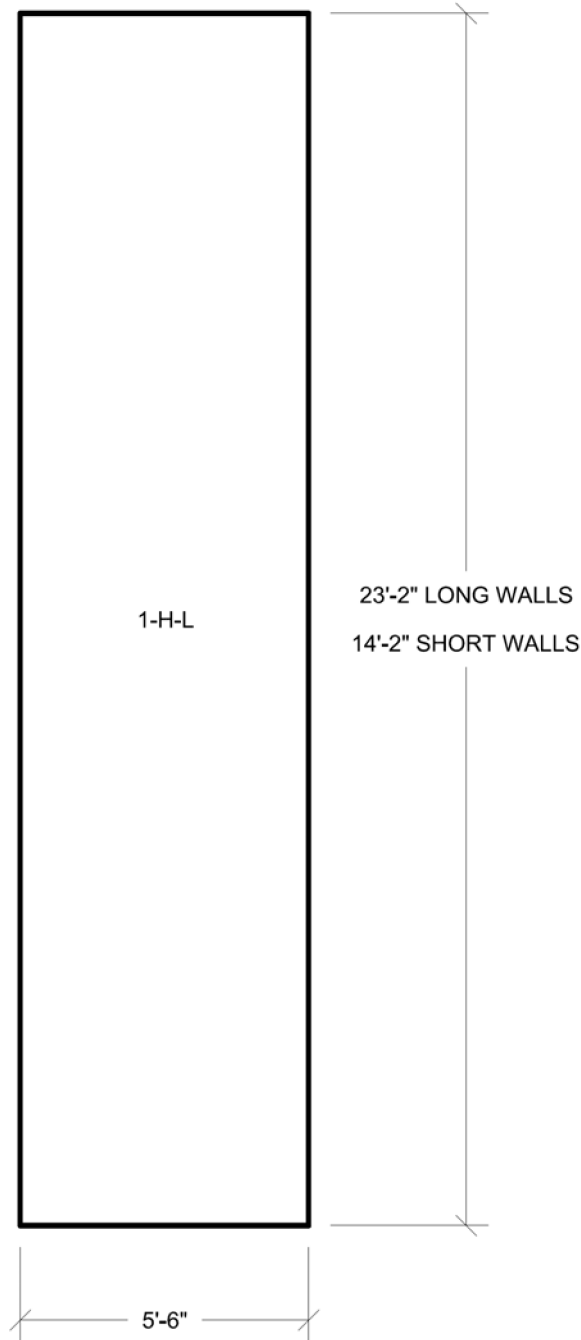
H.7-9 Access Region Walls Looking From Outside Horizontal Reinforcement Zones Near Side and Far Side Faces
